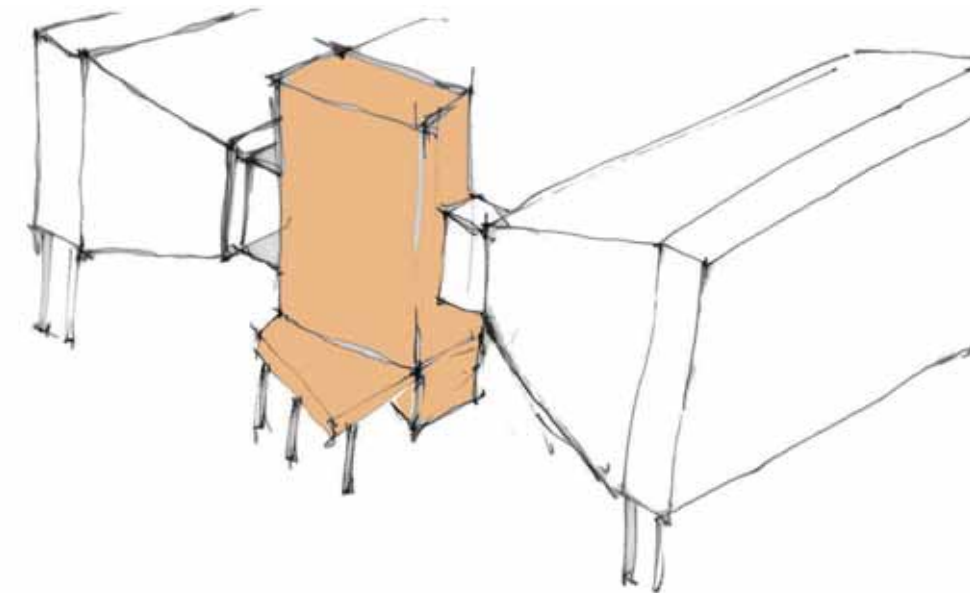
A sketch of the new connecting to the old (Author, 2010).
